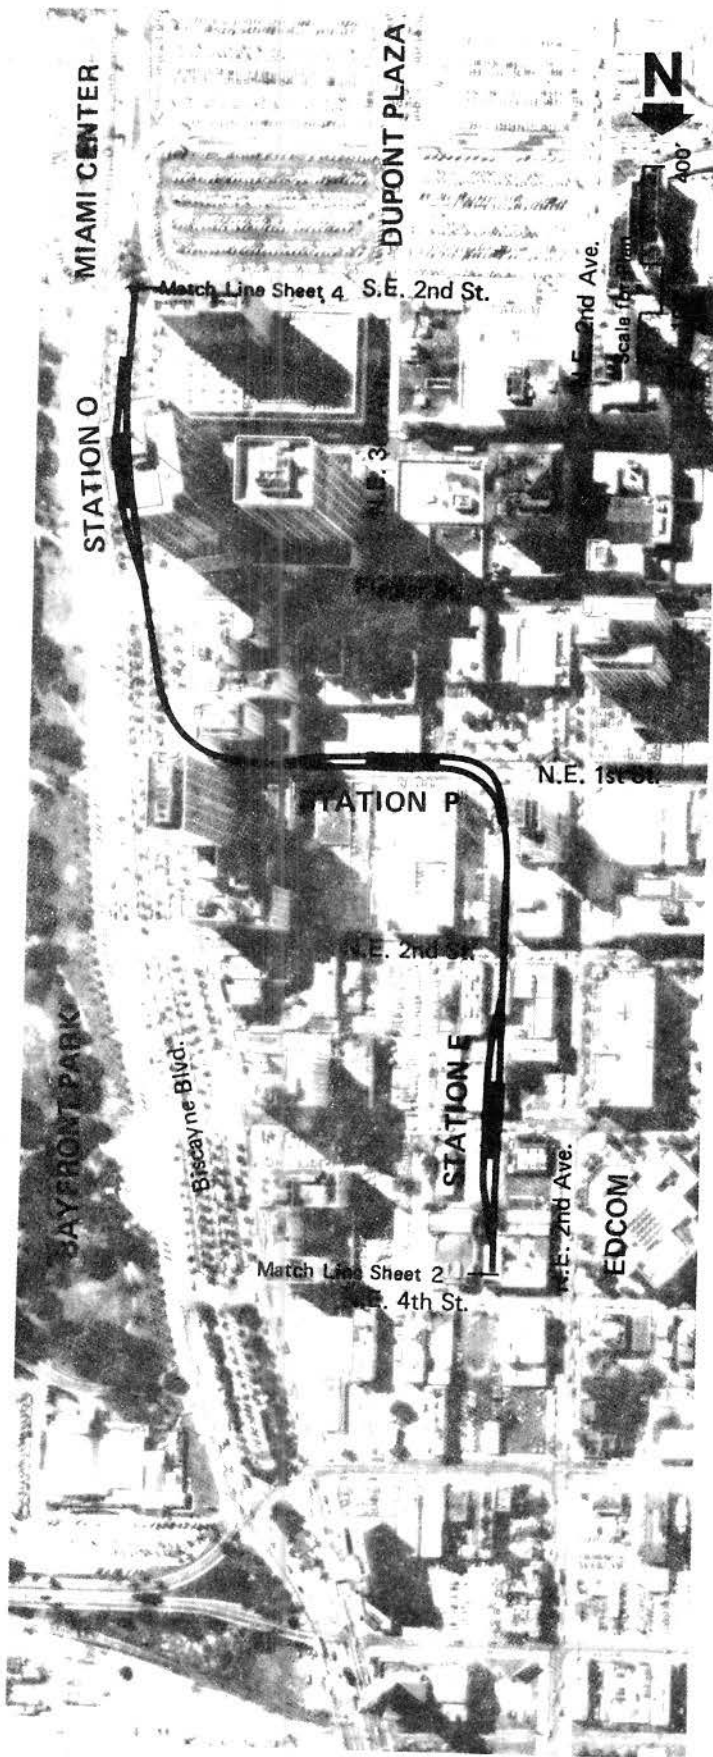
DPM PLAN AND PROFILE SHEET 3
